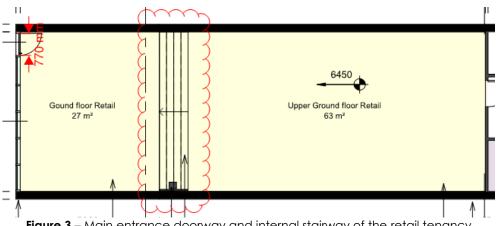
Main entrance doorway and internal stairway of the retail tenancy
